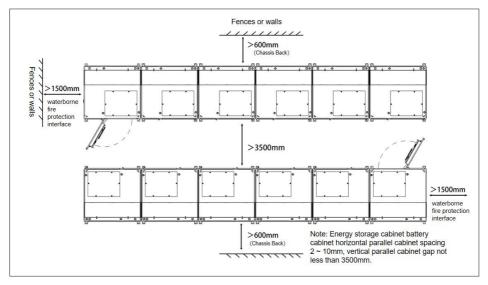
Storage Cabinet Parallel Cabinet Installation (Face-to-Face)
